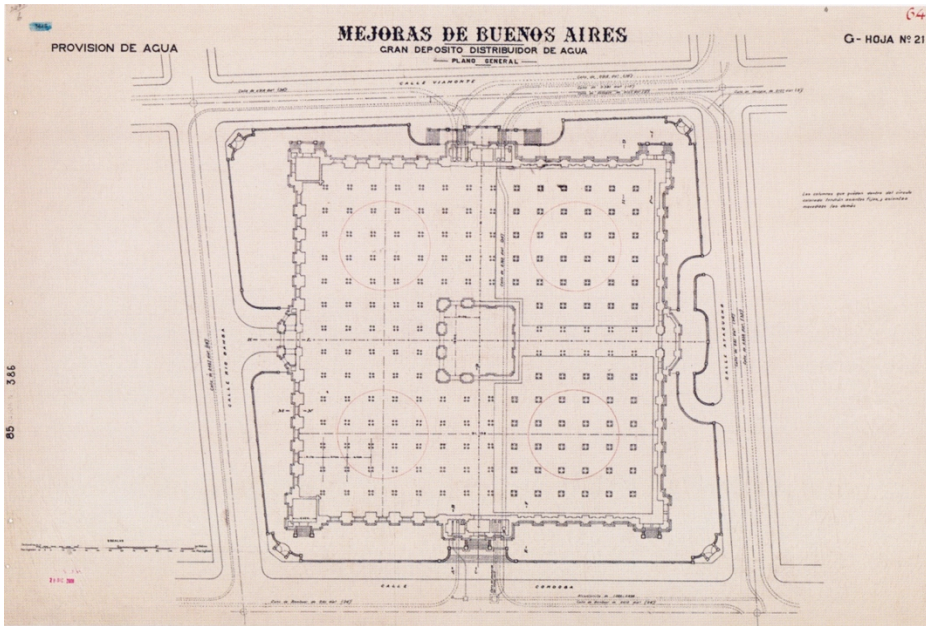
Floor plan for the Palace of Running Water. Source: Ibid., p. 106
